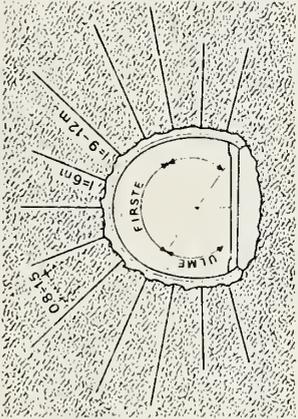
GROUNDCLASSES FOR ARLBERG TUNNEL, AS-BUILT
